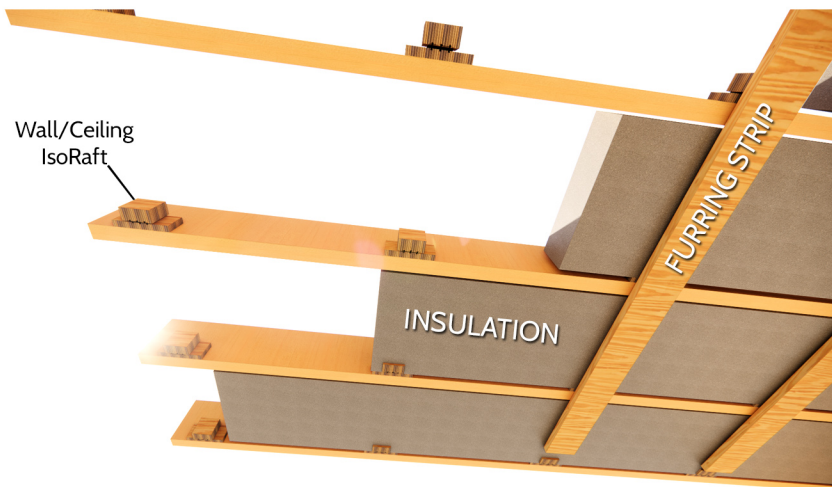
Ceiling IsoRaft assembly with joists and furring strips
